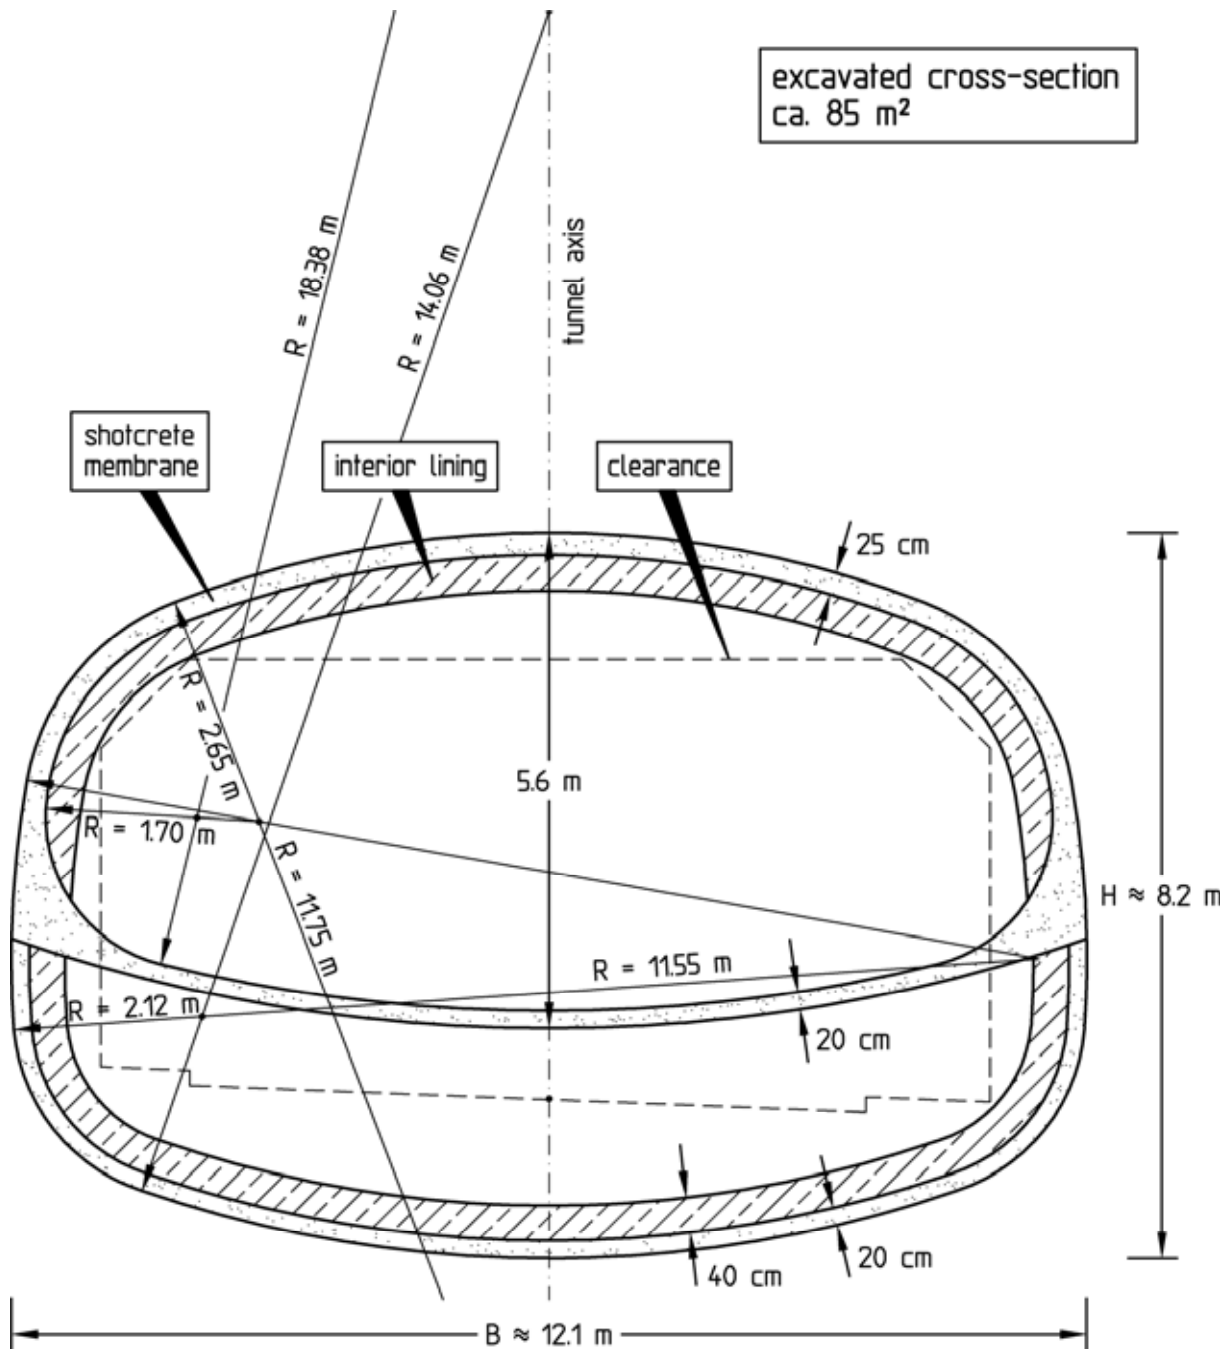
Elite Tunnel, contractor's design proposal, cross-section
